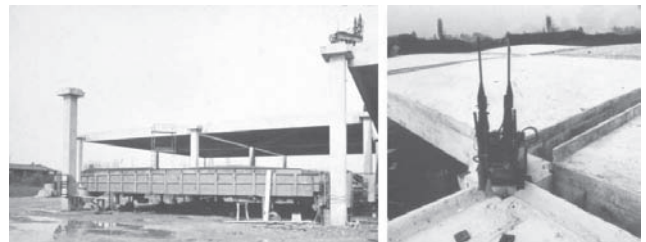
View of the construction site with self stressing form and a detail of the lifting equipment.
